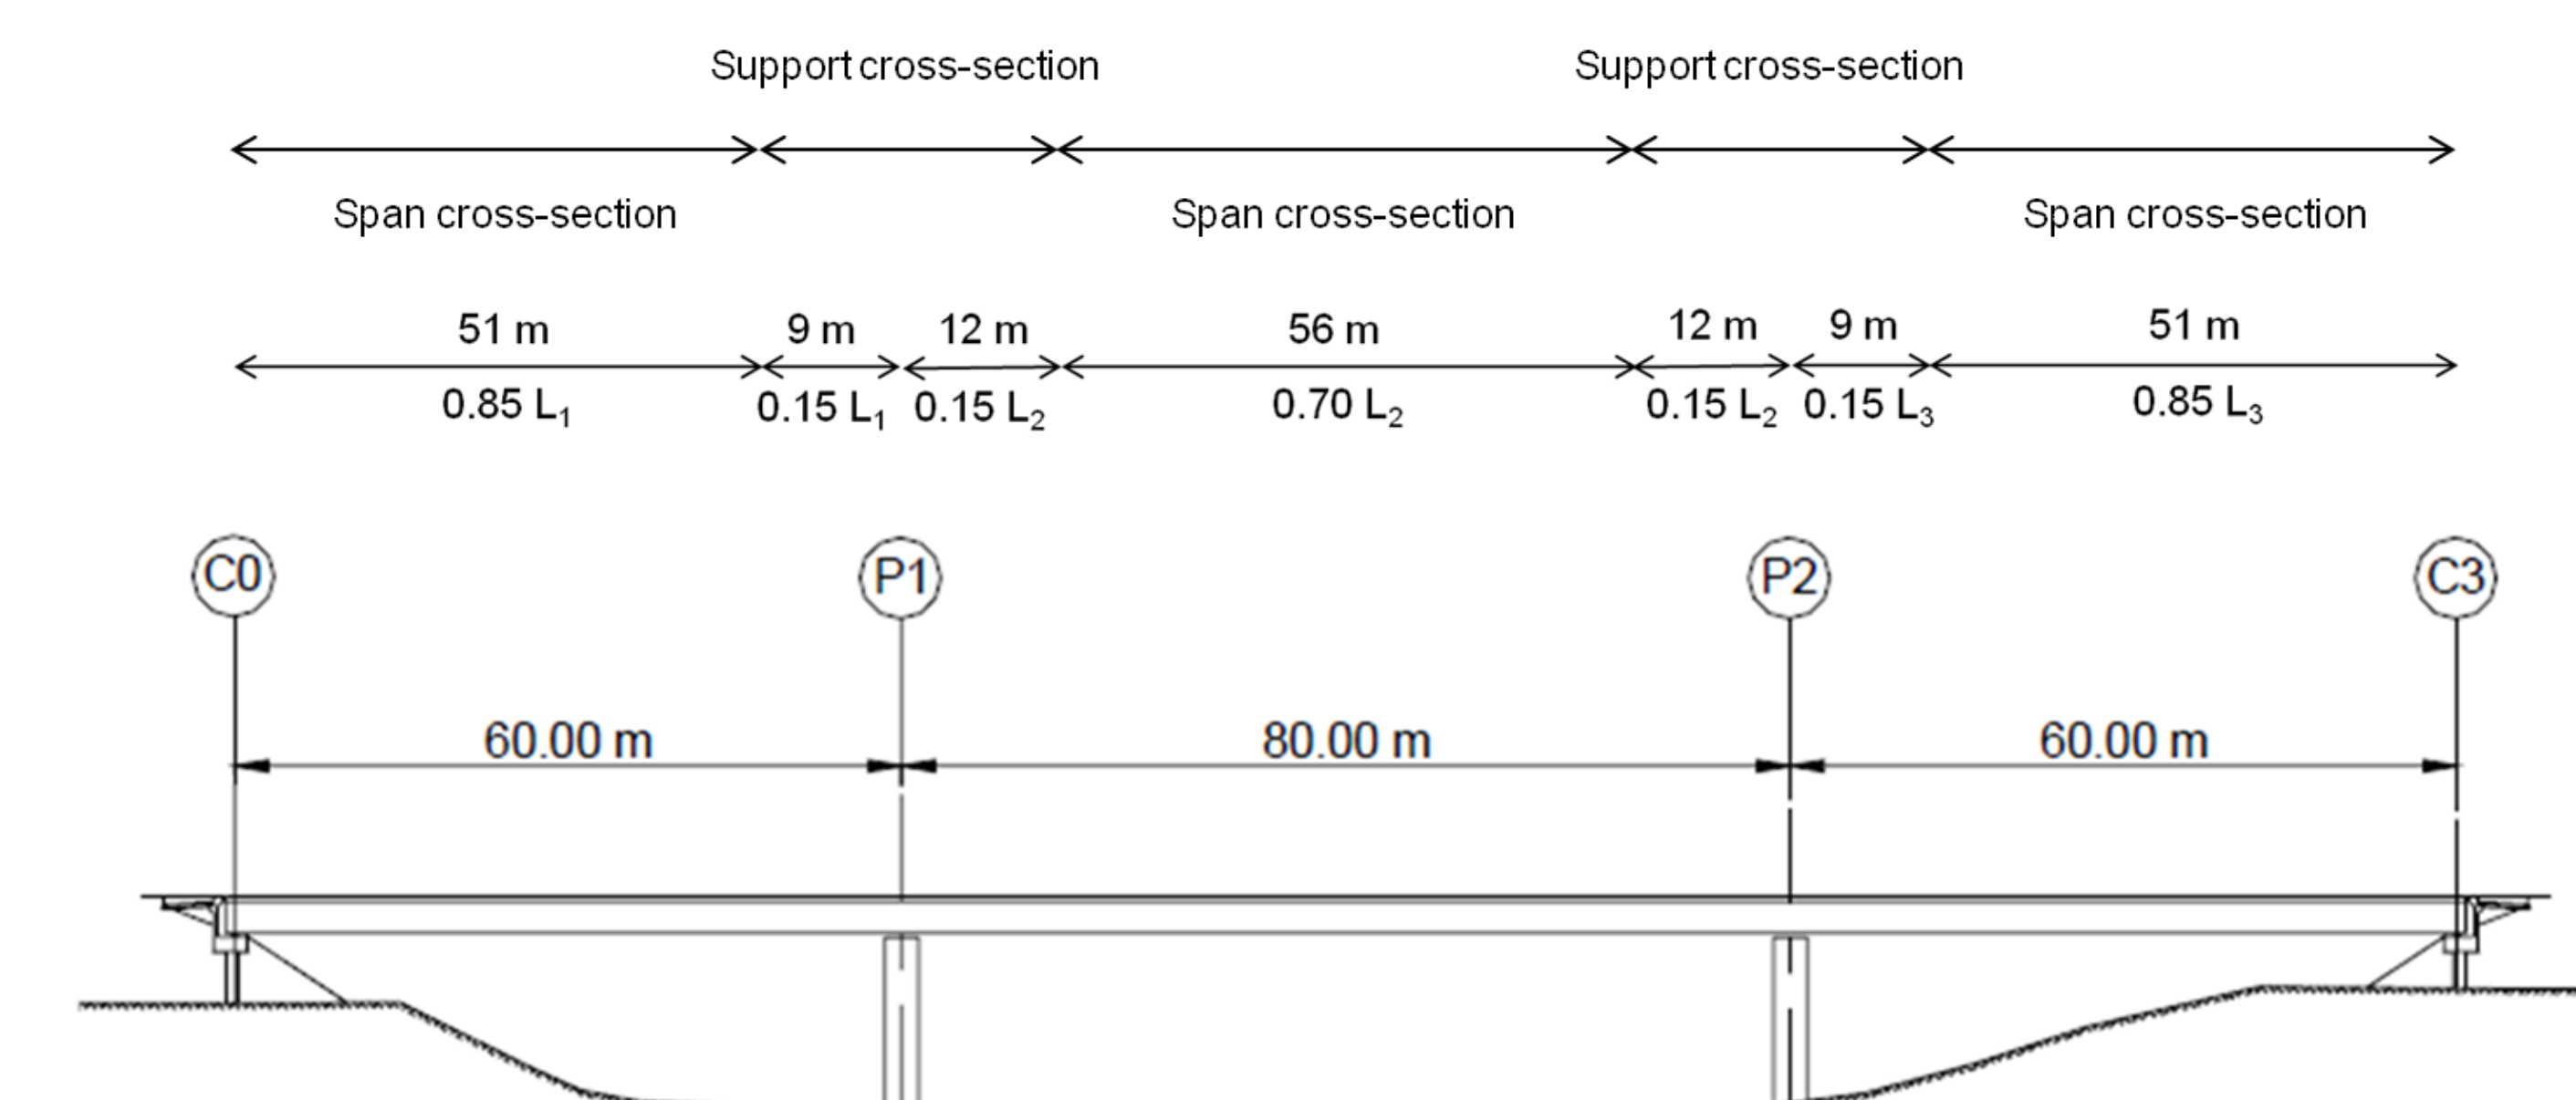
Elevation of the bridge, with the distinction between span and support zones
